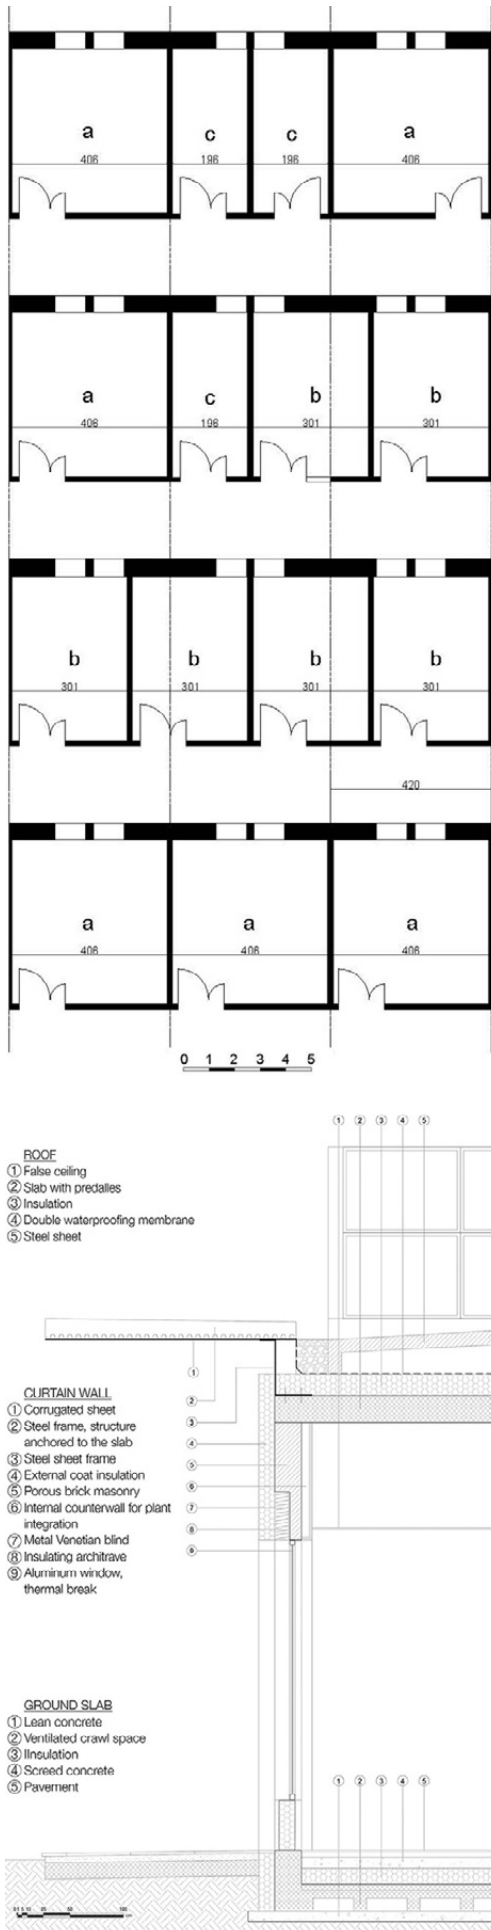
| 'Flexible' floor plans of outpatient (16 sqm, 13 sqm) and storage (9 sqm) spaces.
